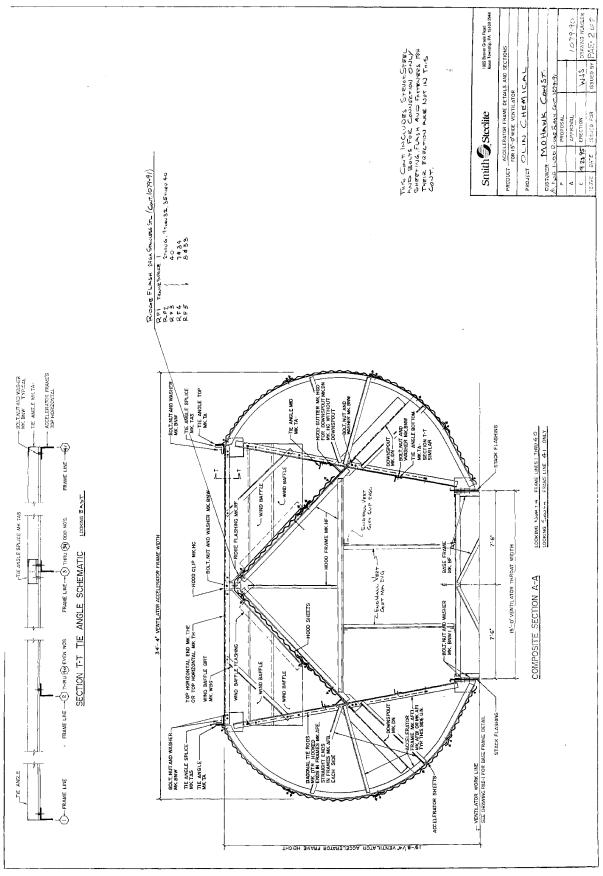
Cross-section of roof ventilator showing internal structure.
